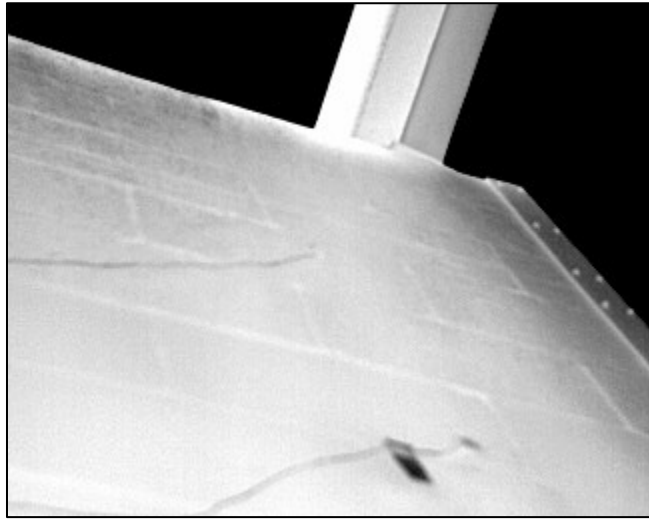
Thermal Image at Location 8 at 1:51 PM (North Side of Wall 2)
